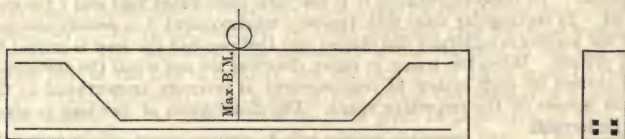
Reinforcement for Uniformly Distributed or Symmetrically Placed Load
